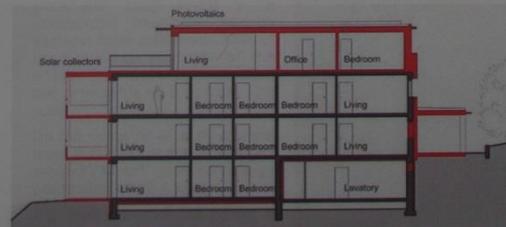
Vertical section of building. New parts in red (new balconies to the South, additional penthouse apartment, building annex for new heating system)
